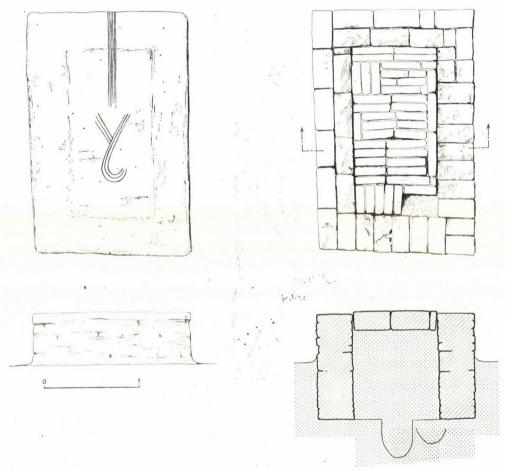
TAC II/1 Tomb, superstructure and cross-section
